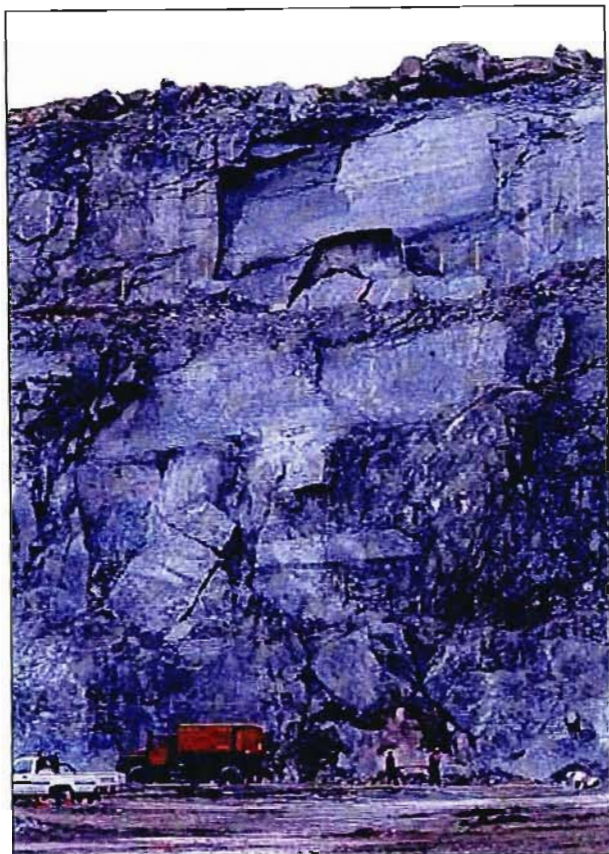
Photograph of a planar failure occurring on the western highwall.
